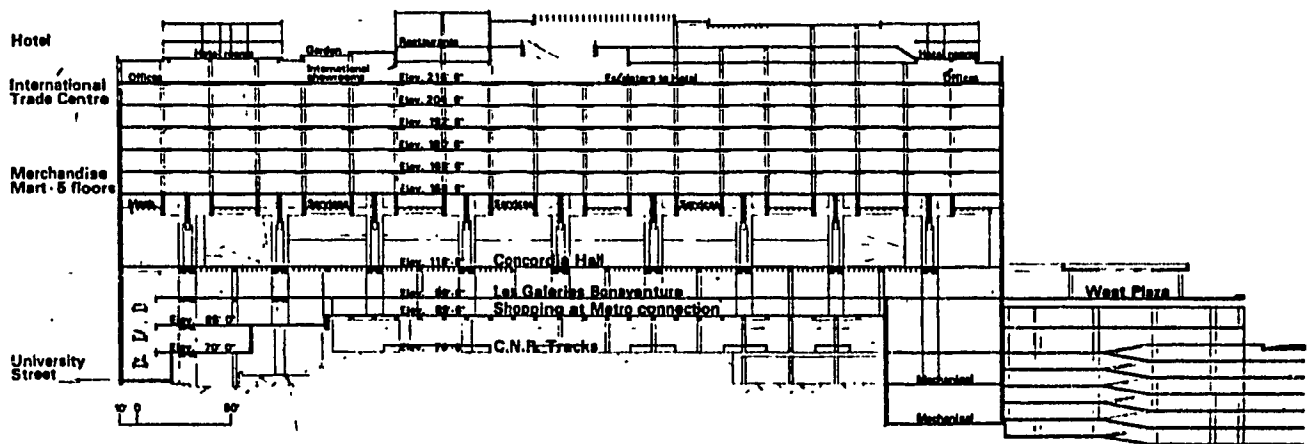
ARCOP, Place Bonaventure, Section Looking South, 1966.
